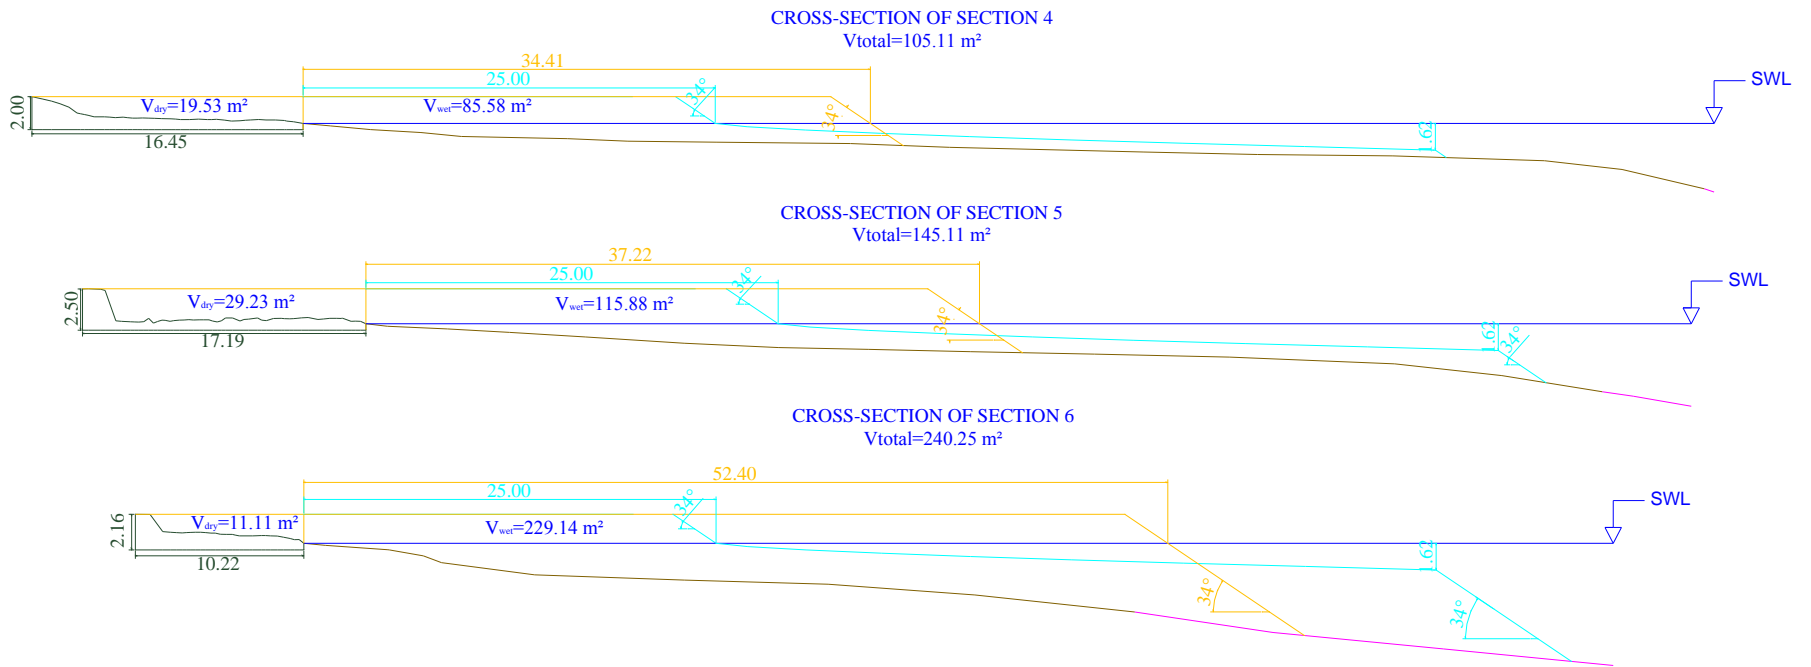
Design profiles of Section 4,5 and 6 for 25 m new dry beach width ($D_{\text{fill}}=0.32 \text{ mm}$).
